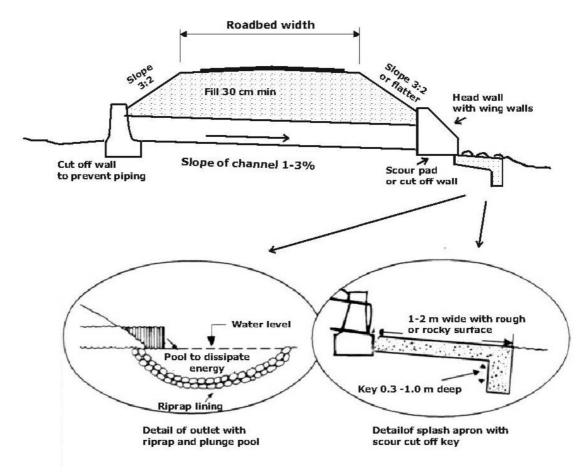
Culvert installation and outlet protection details with splash apron or riprap lined plunge pool for energy dissipation and scour control
